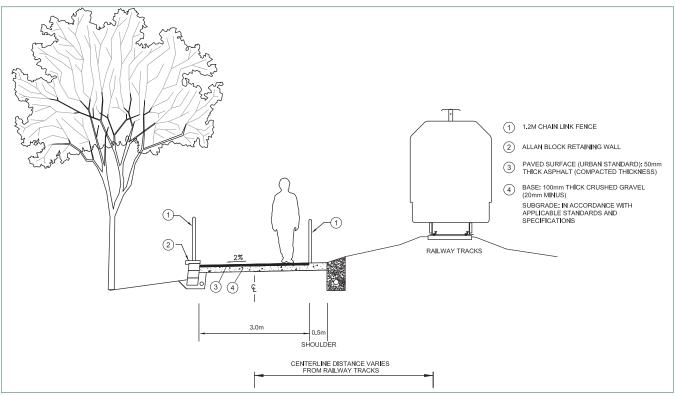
Typical Cross Section A: 15 metre (50 foot) or constrained corridor.
